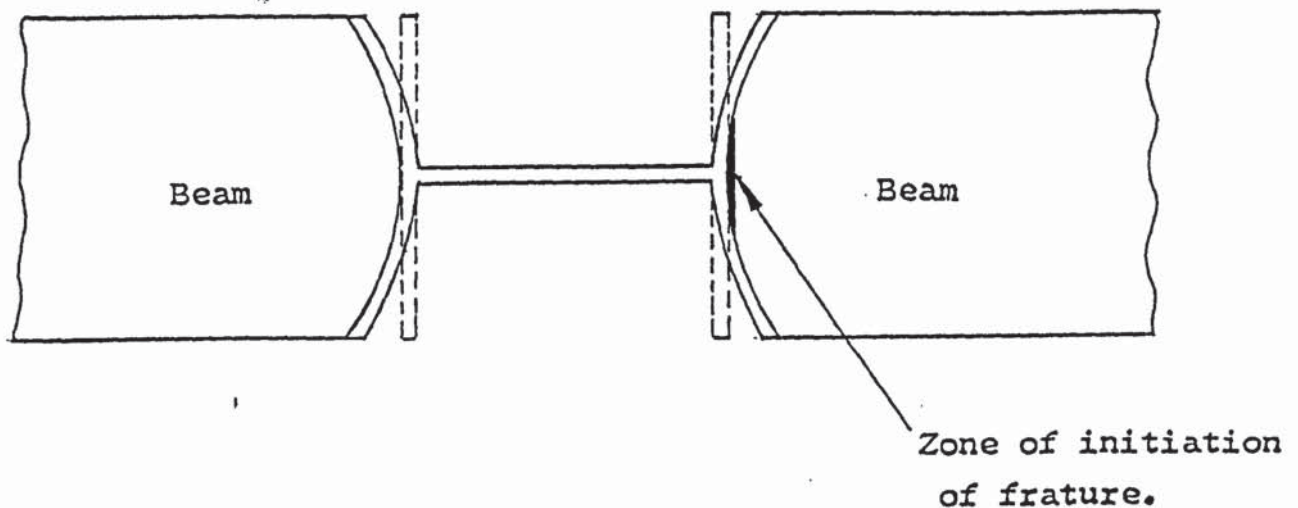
Initiation of weld fracture in unstiffened
